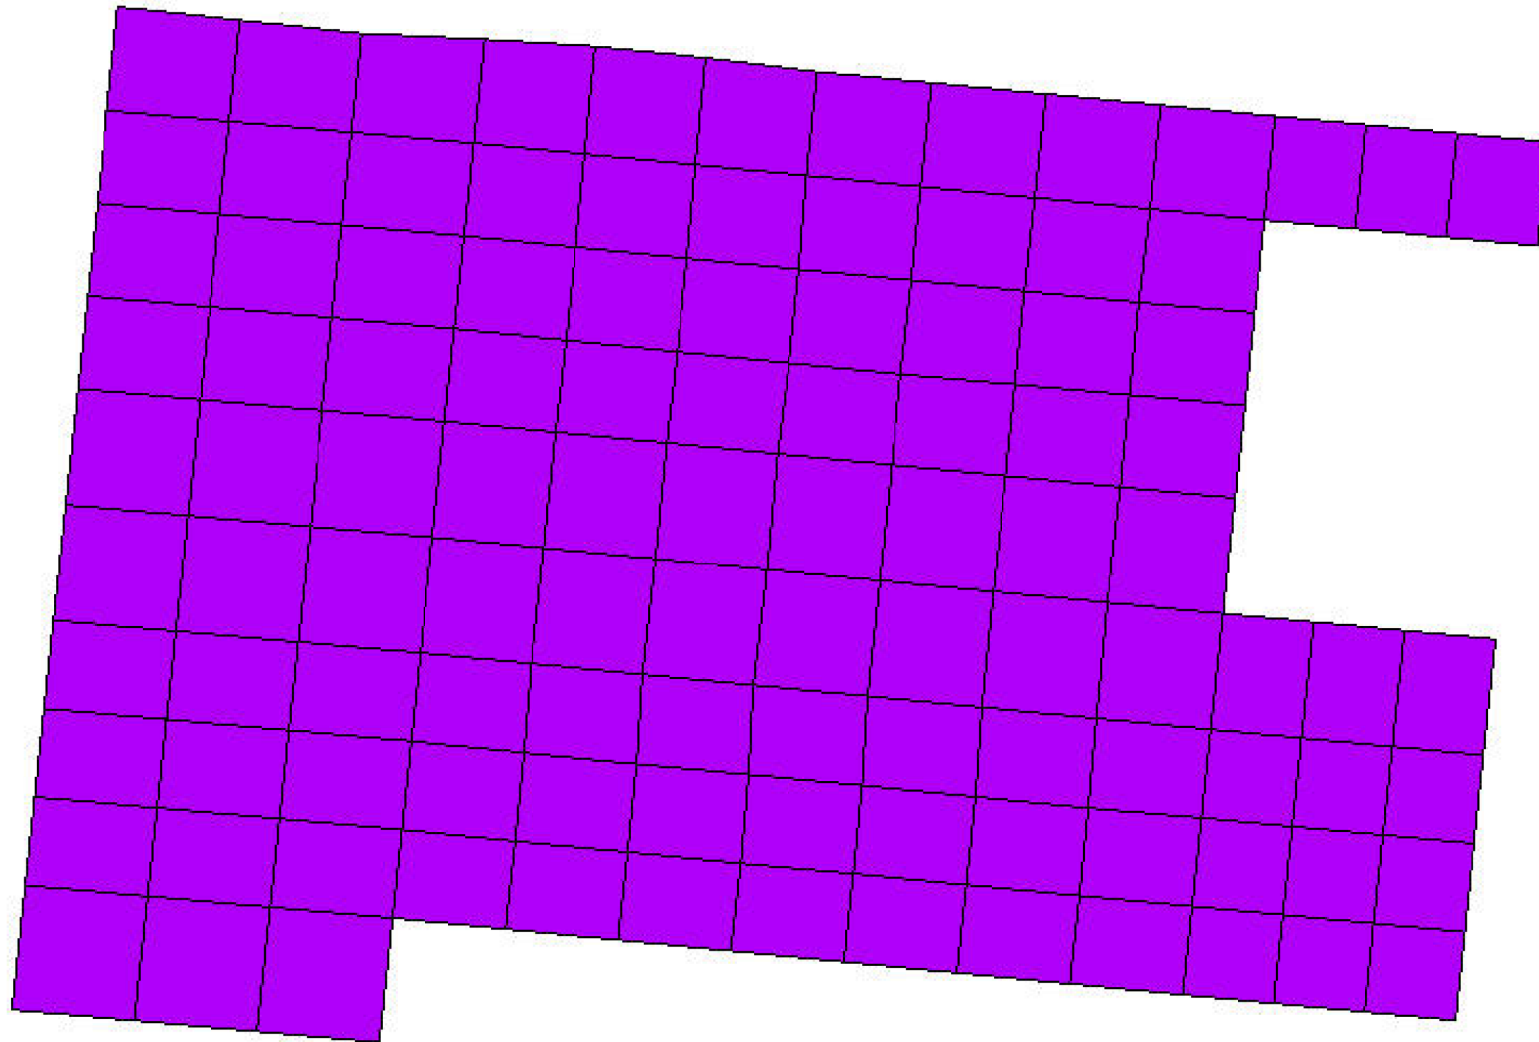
E.1.16-7—FB Hardened Shell West Wall 16F
